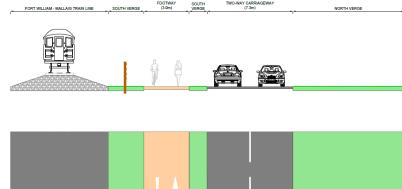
Typical Cross-section of Shared-use footway between carriageway and rail track
